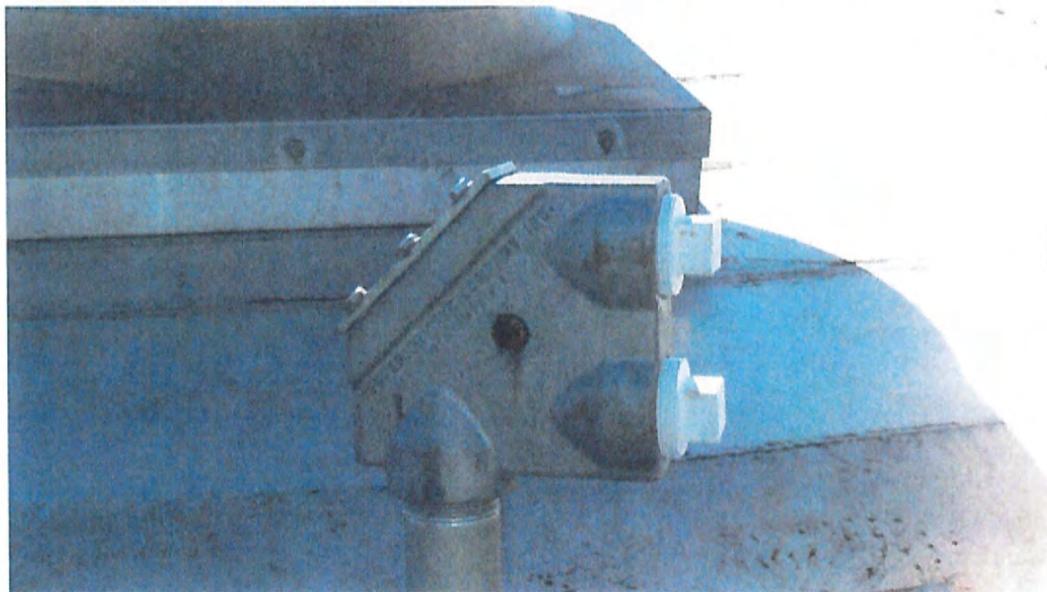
Red Hill Tank – Water level assembly completely removed and plugged (CLOSEUP).
